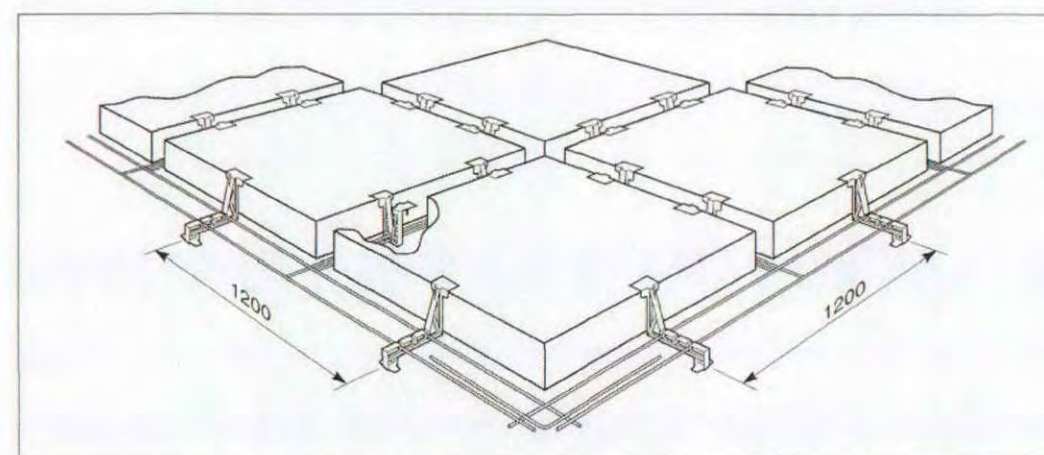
Detailed Layout of Pods and Spacers (mesh and top steel omitted for clarity)
